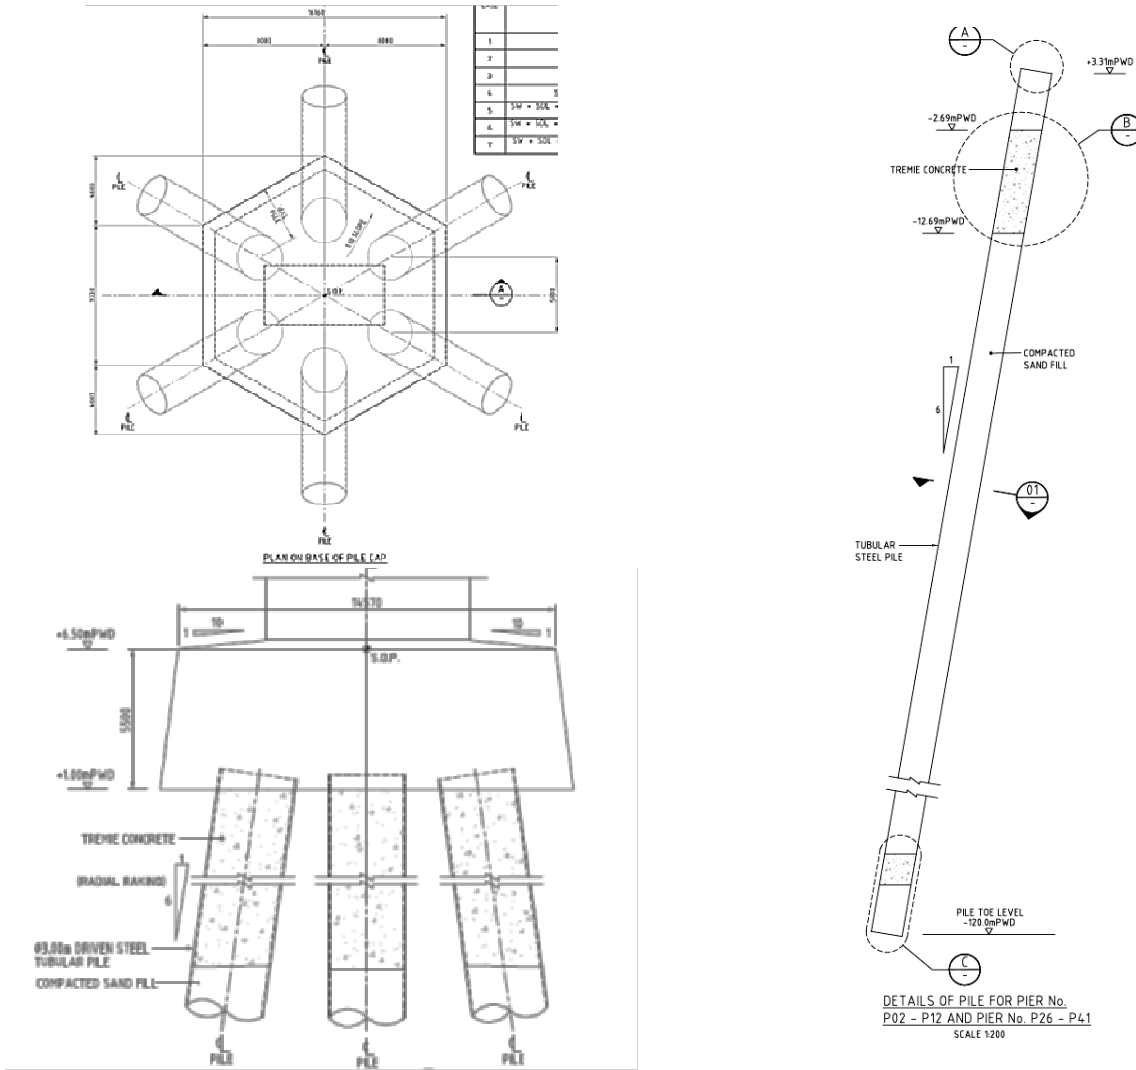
Main Bridge Pier Raking Steel Tubular Pile Foundation Arrangement
